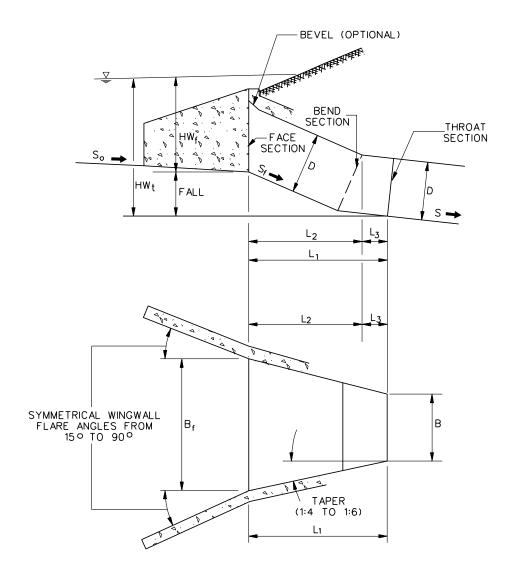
Slope-Tapered Inlet with Vertical Face
